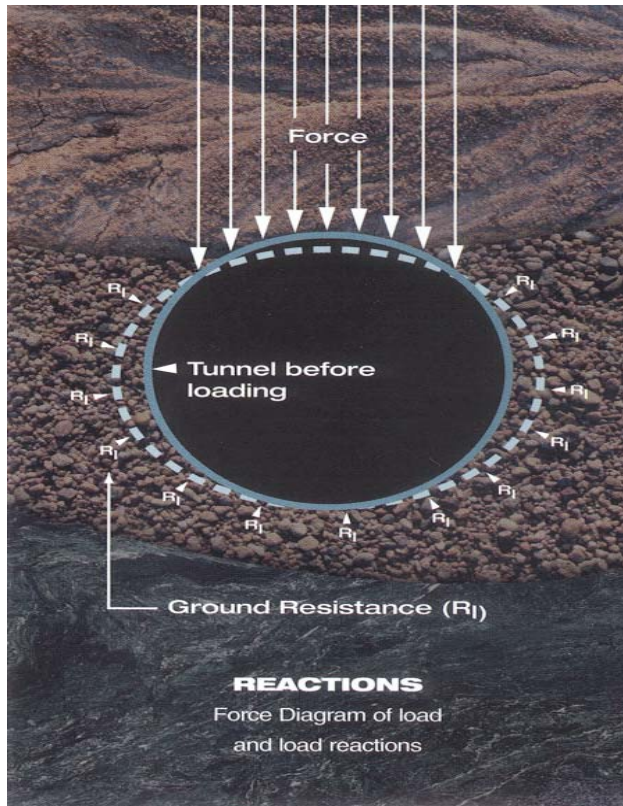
Function of tunnel liner to control ground pressure by distributing loads back into the surrounding ground.
